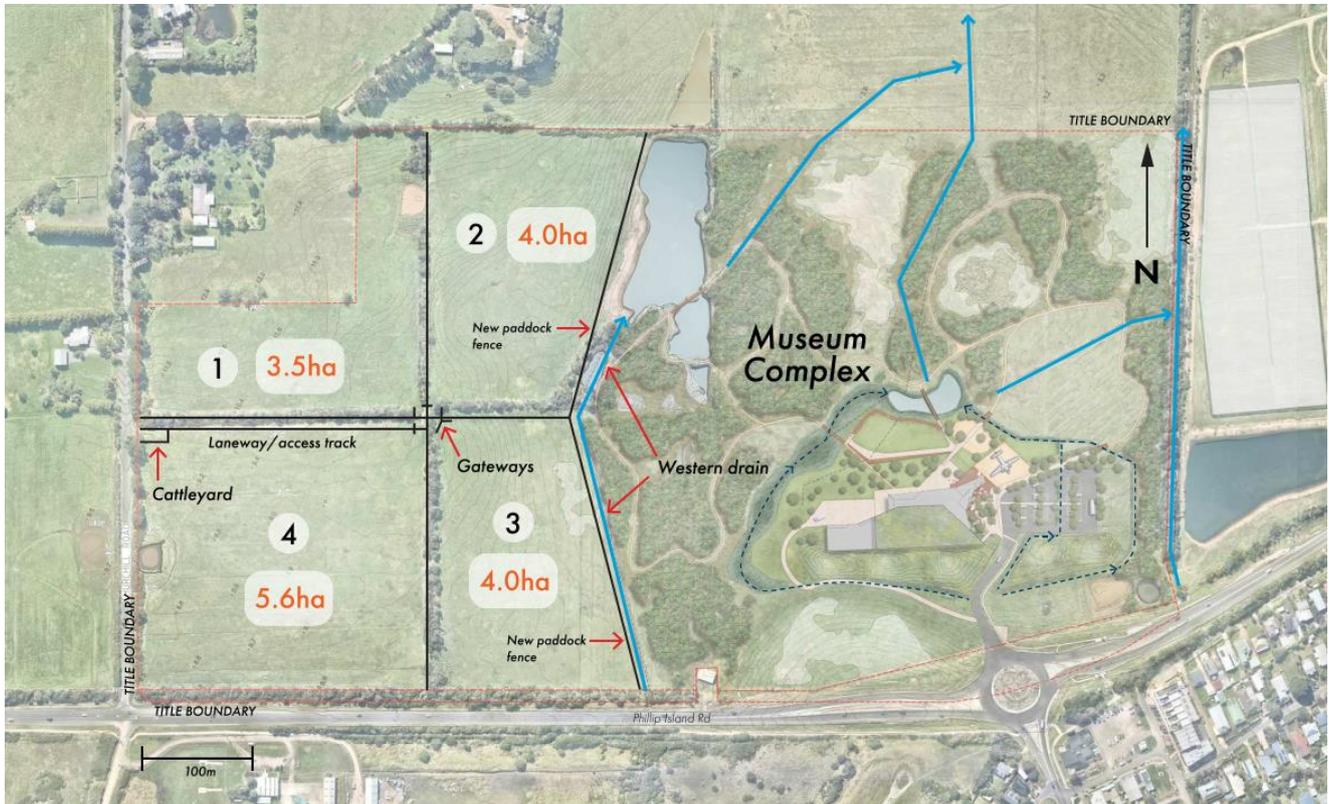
Proposed Overall Site Plan (blue arrows show existing surface drains)
